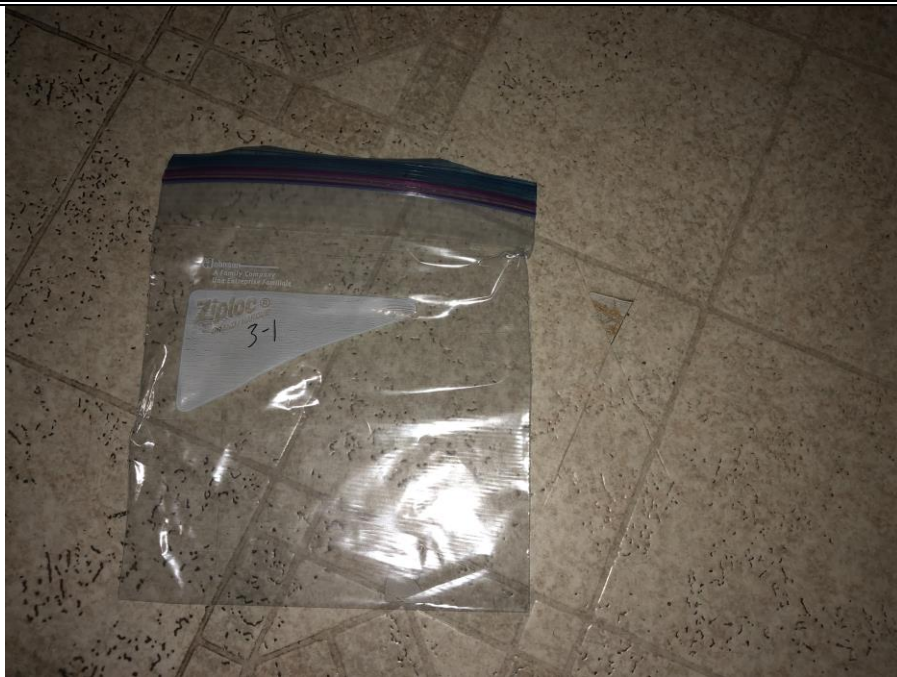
VIEW OF SAMPLED ROLLED VINYL FLOORING.
